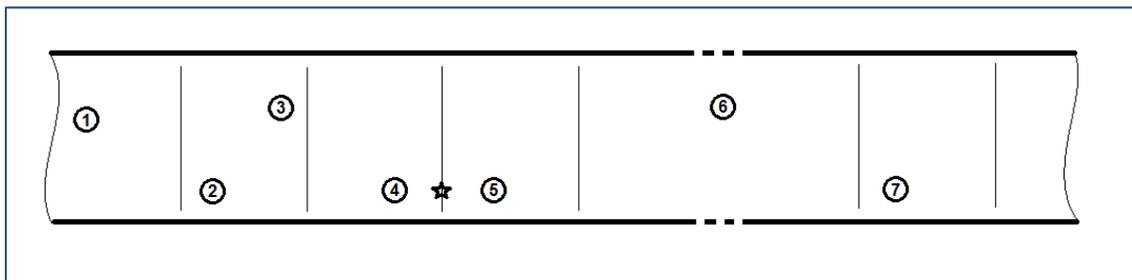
Diagram of sensors locations on girder 9 (not to scale). The crack location is marked with star.
